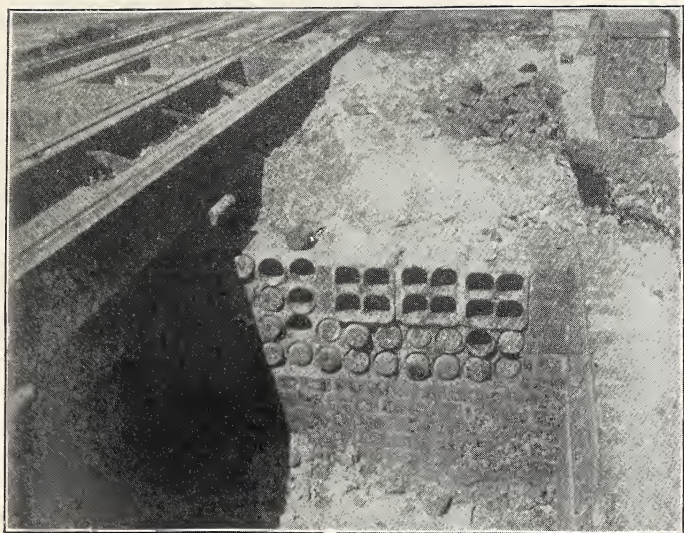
FEEDER CONDUITS IN MANHOLE.
